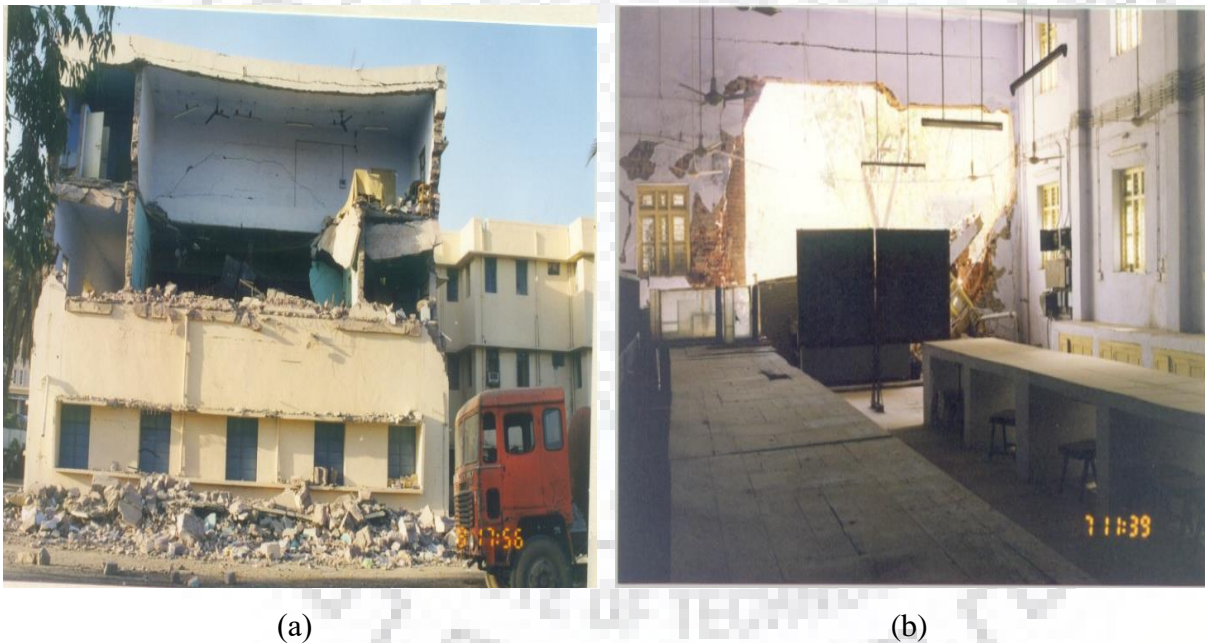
1 : (a) Out-of-plane failure of Zila Panchayat building at Bhuj (Dubey, 2011) (b) Out-of-plane failure of a long unsupported masonry wall at Engineering College, Morbi (Dubey, 2011)
